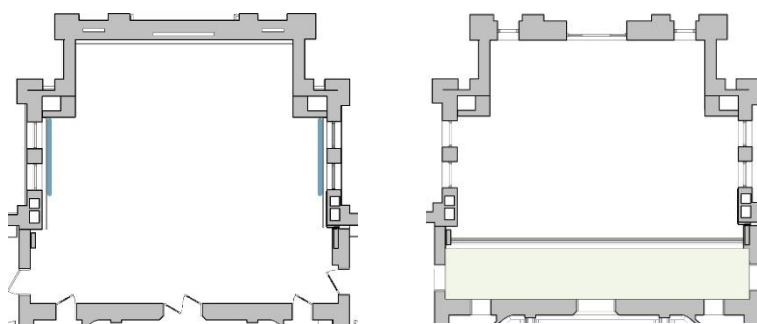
Historic Supreme Court Meeting Room Floor Plan and Reflected Ceiling Plan
